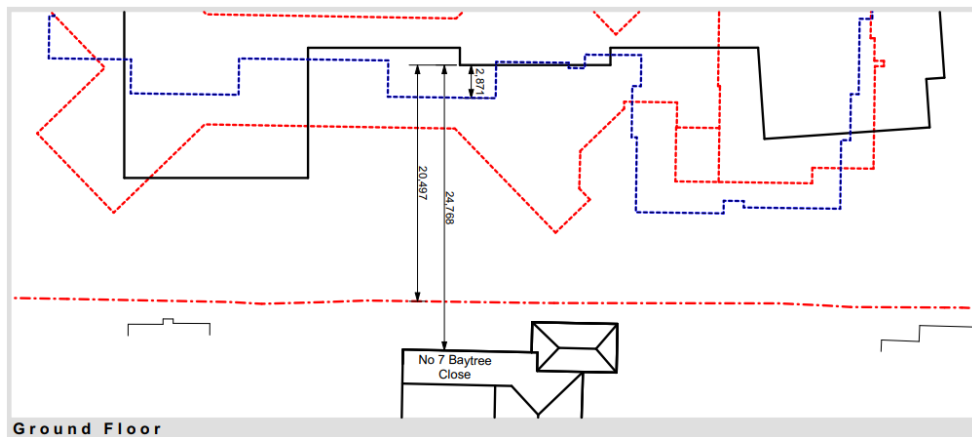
Comparison of proposed ground floor plan (Red line indicates existing building. Blue line indicates previously refused scheme. Black line indicates proposed building line.
